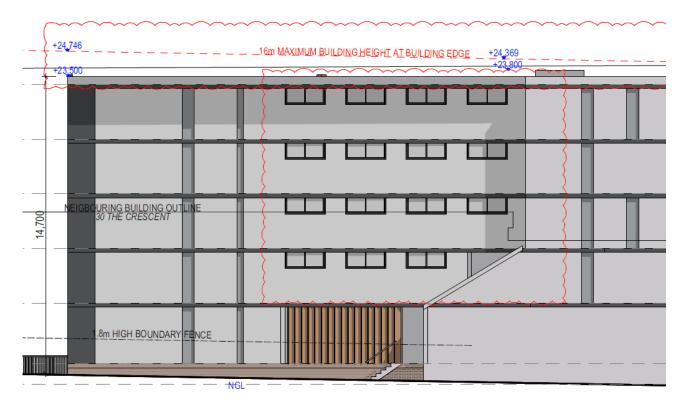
Extract of the proposed eastern elevation, noting the enclosure of the previously open circulation corridors and provision of high level windows.
